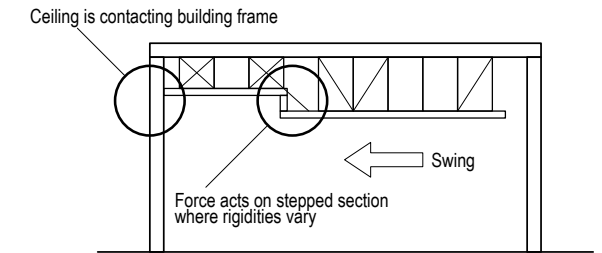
Sections prone to damage (source: Building Guidance Division, Housing Bureau, MLIT, No. 2402)
